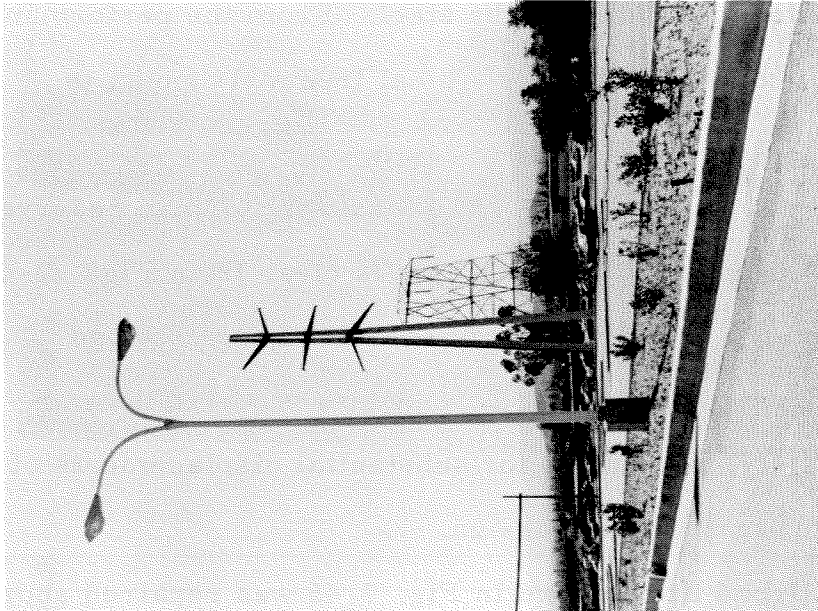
Light standard and new and old transmission towers near Olive View Hospital. The three structures were not damaged.
